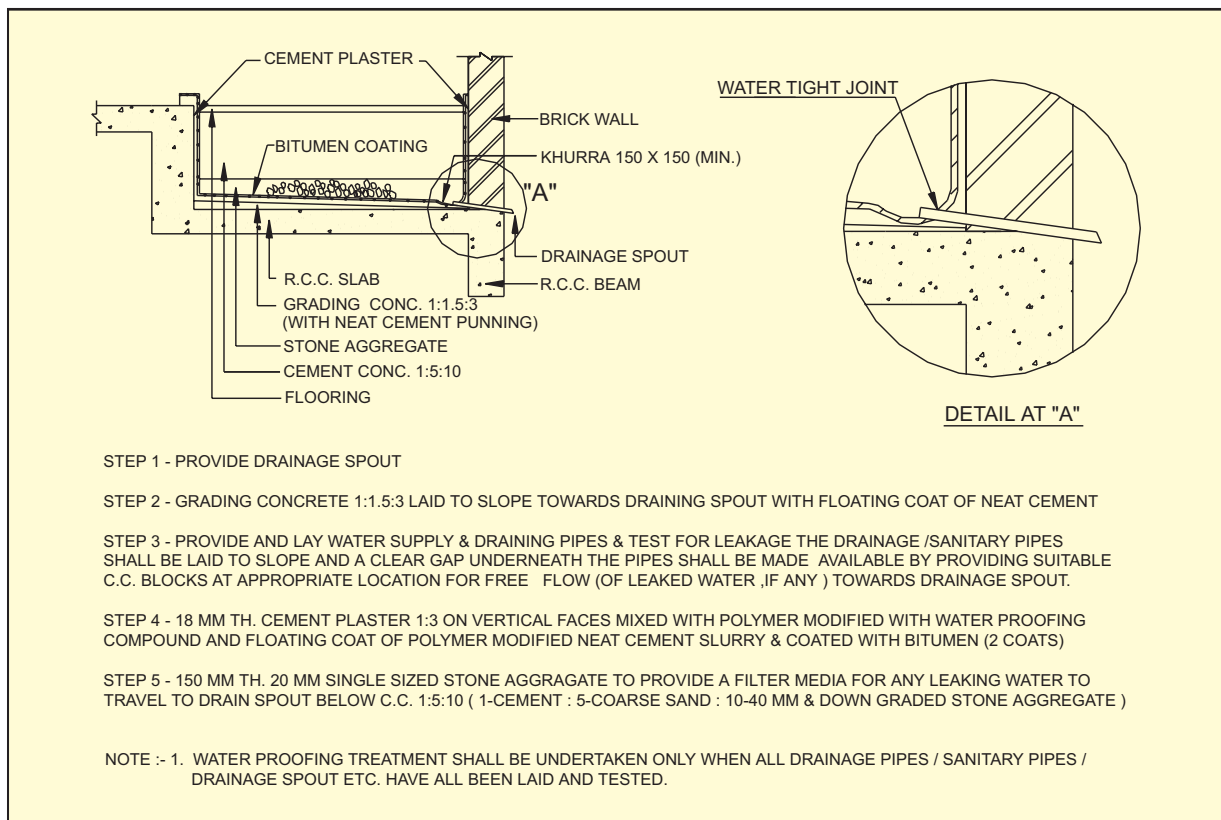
Typical arrangement for treatment of Depressed Floor of Toilets etc.
